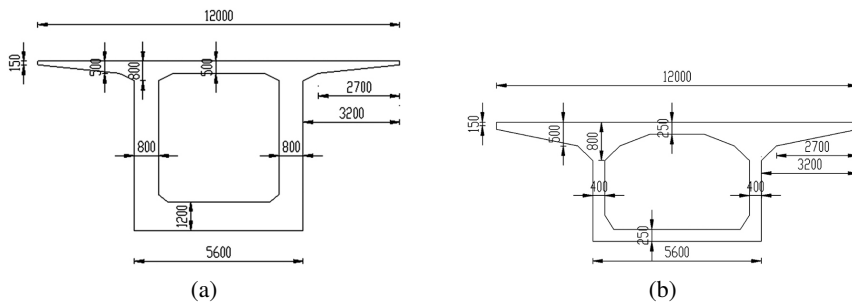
Cross-section view: (a) Top of a pier (b) Mid-span (unit: mm)
